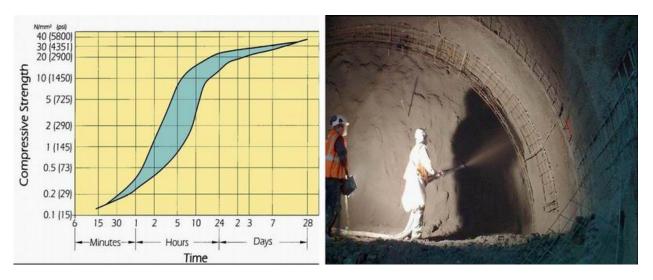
Typical shotcrete hardening curve. Figure 8b: Shotcrete application at top heading of Lehigh Tunnel #2 - Allentown, PA 1990
